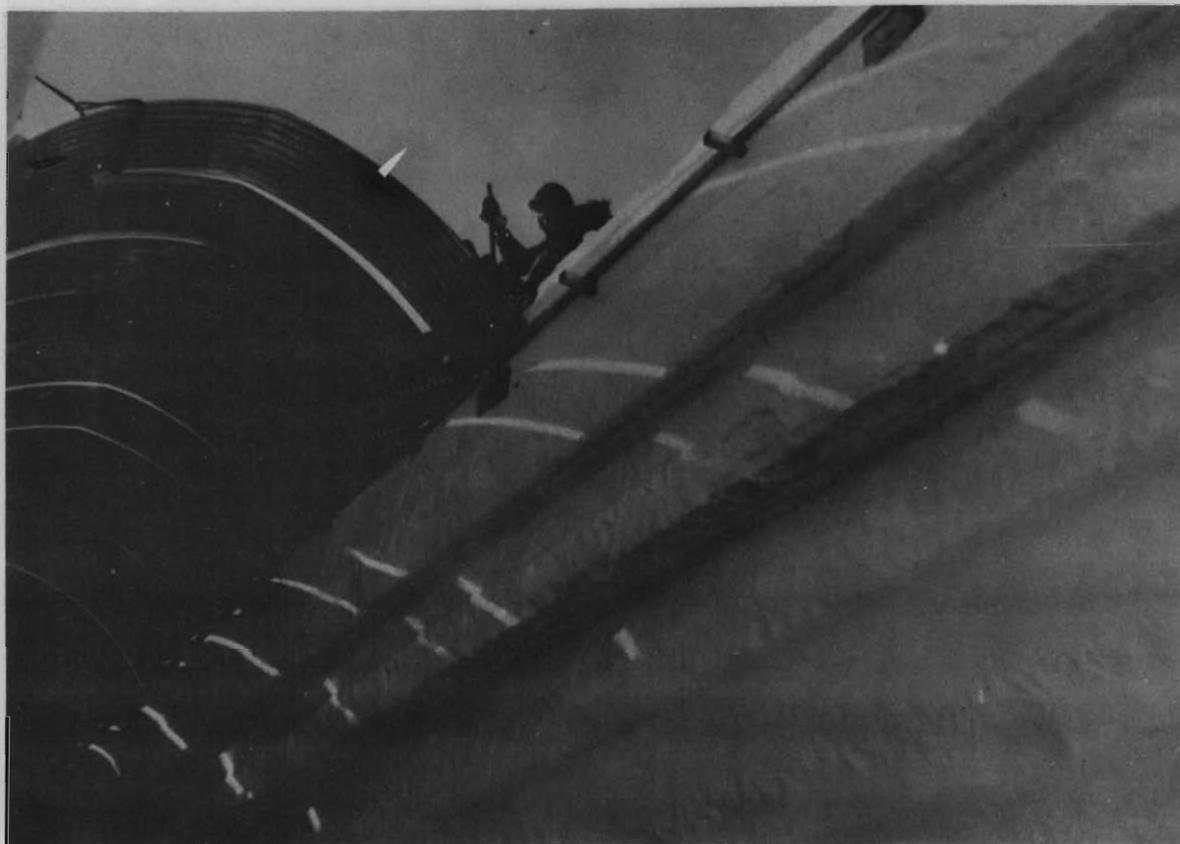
Installing Metal Arch Roof Forms at Camp Century, Greenland (Photograph by Waterhouse)
